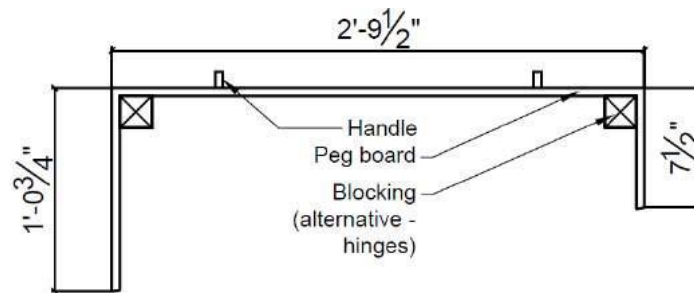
through Figure B-23 show construction details for fabrication of the dense-packing mold used to install insulation at the ridge (Mold - B).
